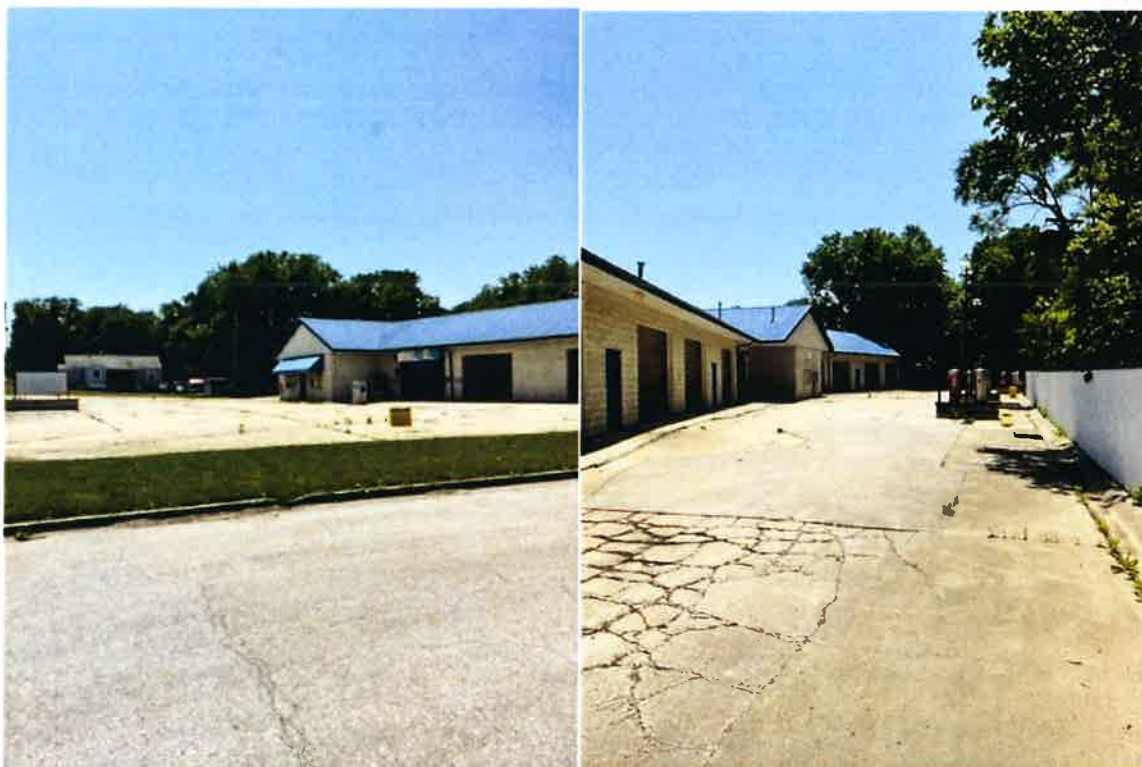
Site Photos Showing Front and Rear Facades of the Car Wash
